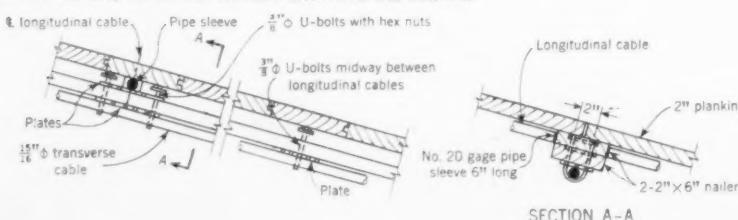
Roof deck consists of 8 x 2 tongue-and-groove treated wood planks, nailed to 2 x 6 nailers, which in turn are bolted to the cables.
